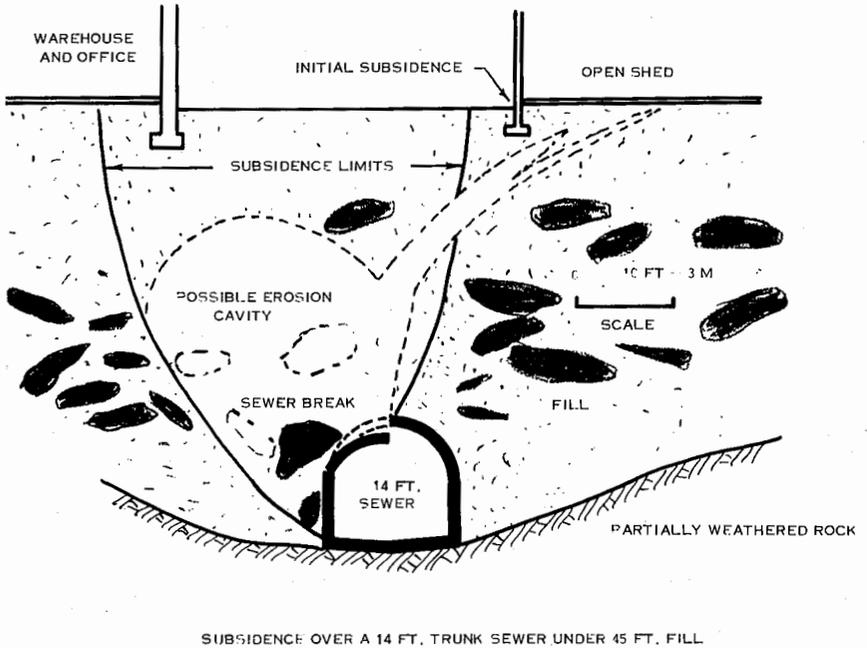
Ground subsidence and building failure produced by collapse of a cavity generated by a damaged sewer flowing under pressure
